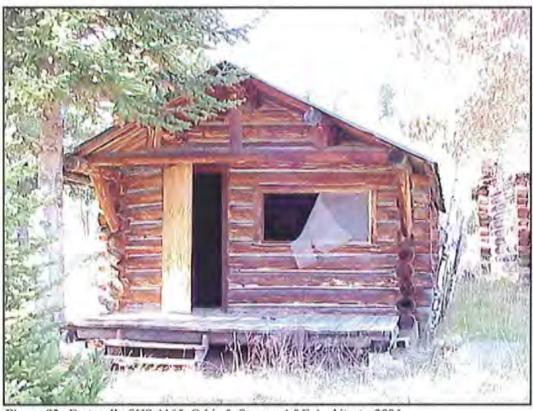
East wall of HS-1165, Cabin 5. Source: A&E Architects, 2004.
